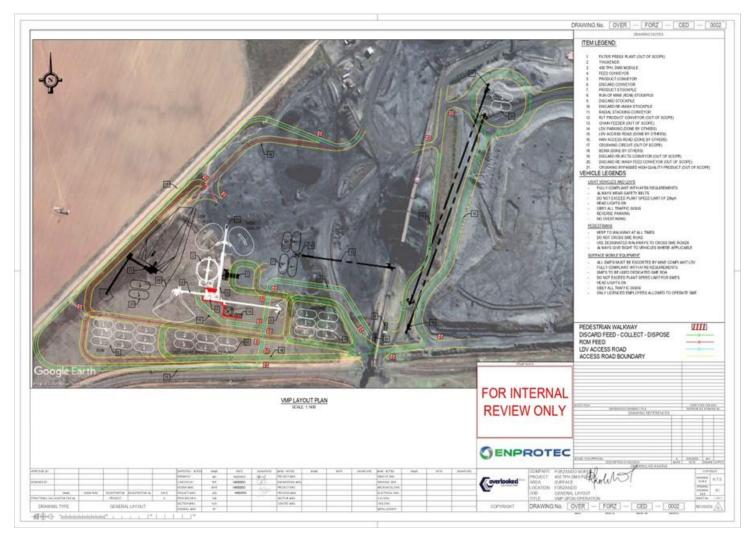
Layout Alternative 2 (Enprotec, 2023)
